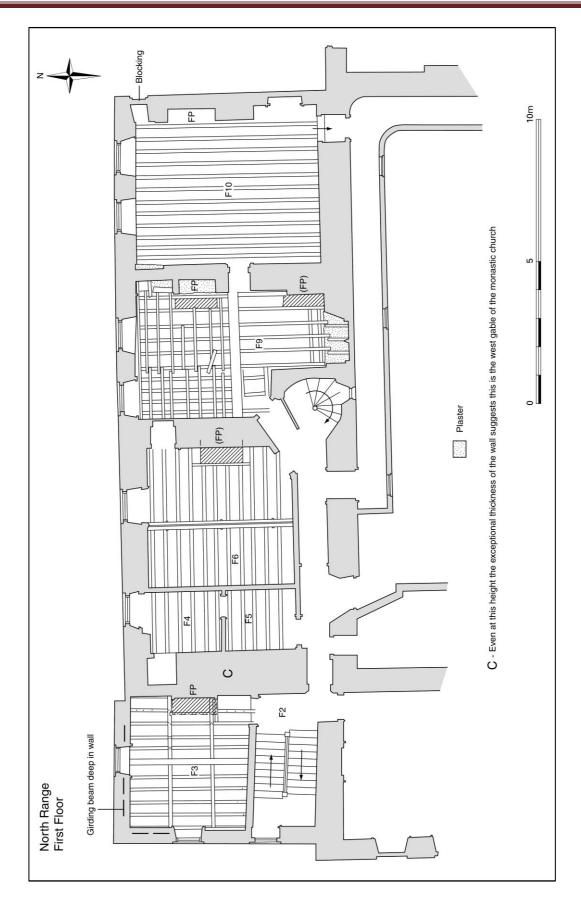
plan of first floor of north range with floor framing (Andy Isham).
